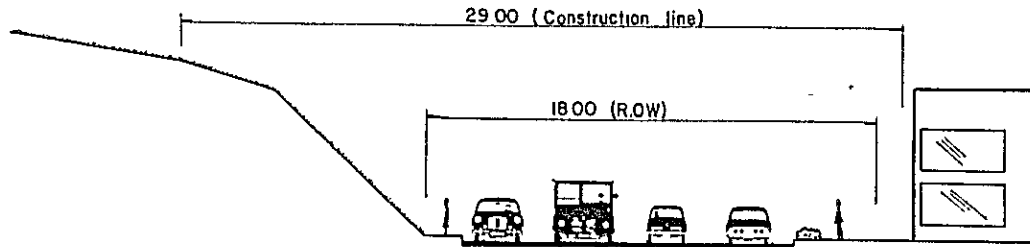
EXISTING CROSS SECTION OF VIA ESPANA(2)
